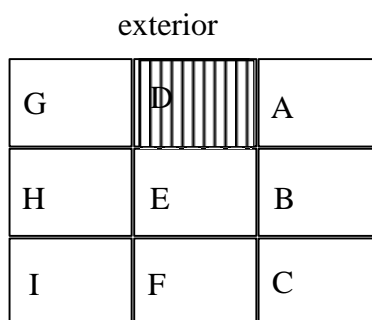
Top view of bearing 1 identifying location of cut sections (shaded area). Block D was stored on a shelf indoors from 1994 until further sectioned and investigated as reported here.
